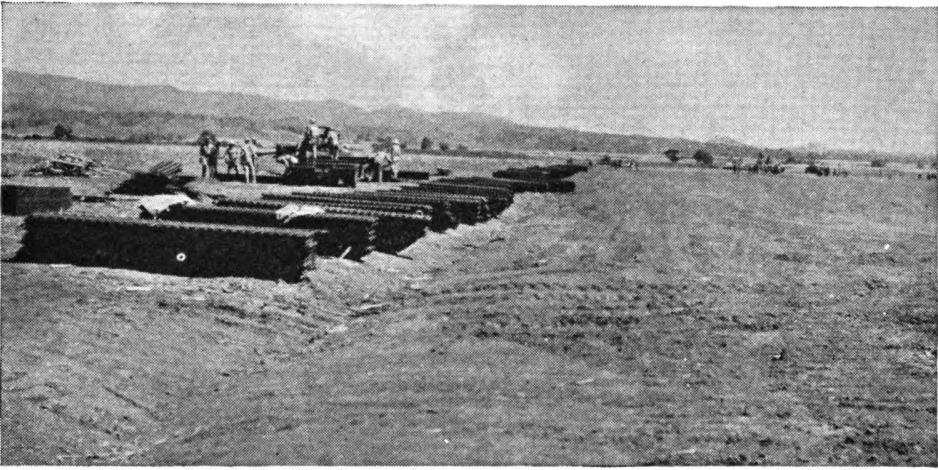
Bundles of panels stock-piled at edge of runway. Note wide, shallow drainage ditch.
